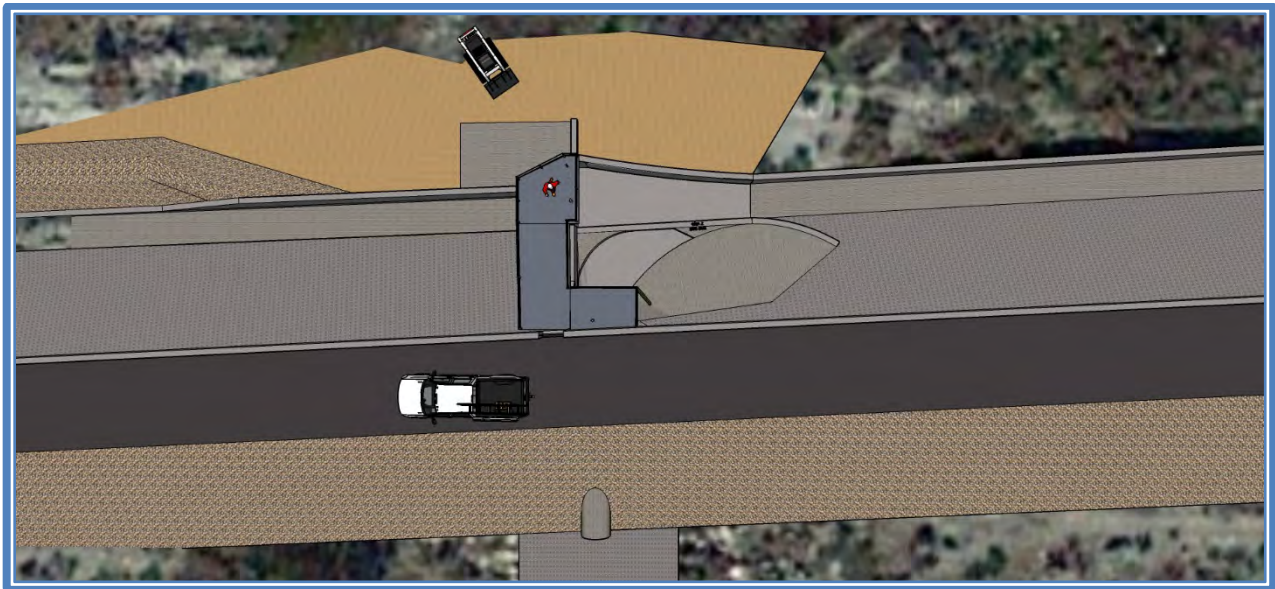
Mill Creek Canal Inlet Conceptual Design (Looking Downstream)
